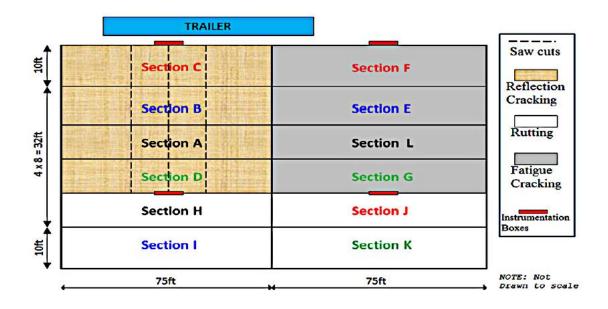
Test Sections Built at the APT Facility (Saeedzadeh et al., 2018).
